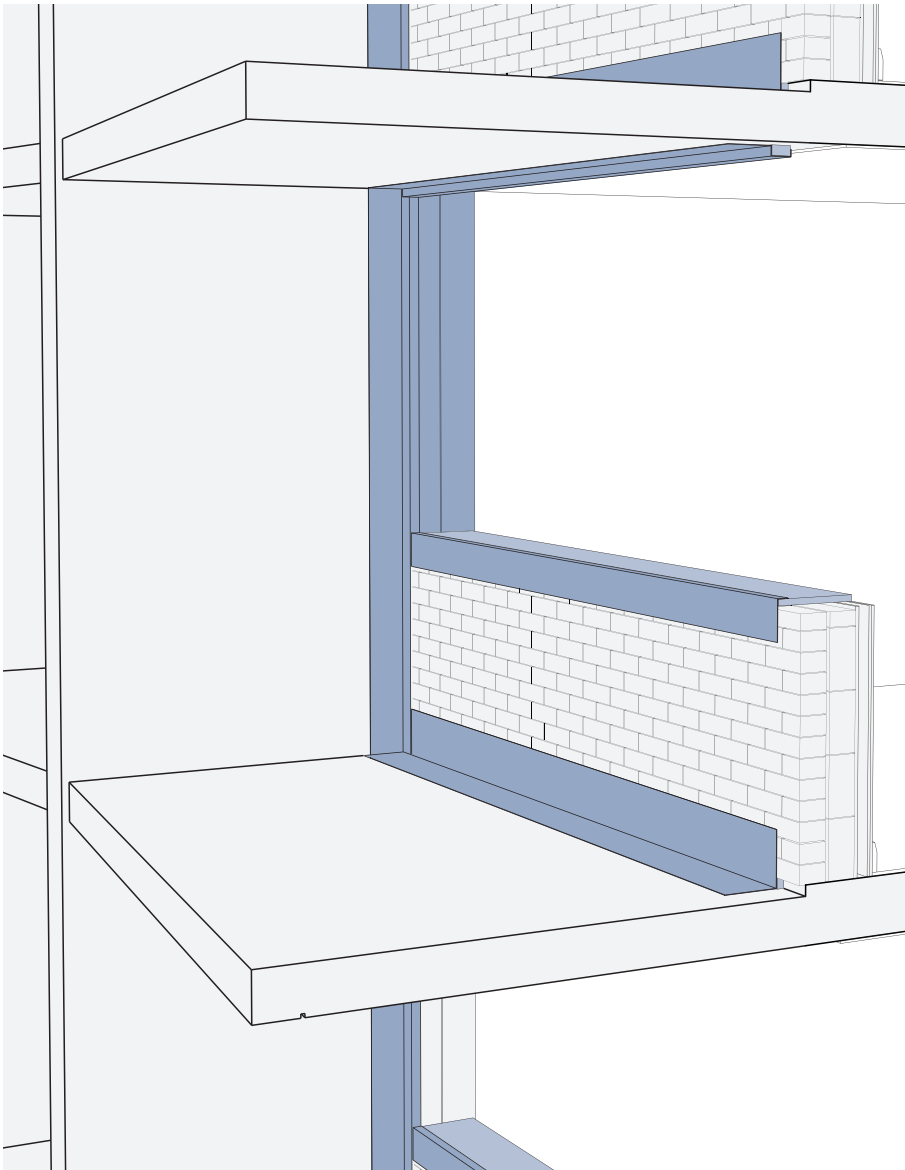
Similar to previous sequence for the regular wall elements, the existing rough opening has blocking installed on the window sill, followed by the placement of air/vapour barrier membrane strips that will later be tied into the air/vapour barrier system. A strip is also placed over the length of the shear wall/ balcony wall intersection. Note that the backing on the air/vapour barrier strips is retained until these later overlap and tie into the wall air/vapour barrier. This is not required if a combined insulation adhesive and air/vapour barrier is trowelled over the entire surface, as depicted in the sequences that follow.
